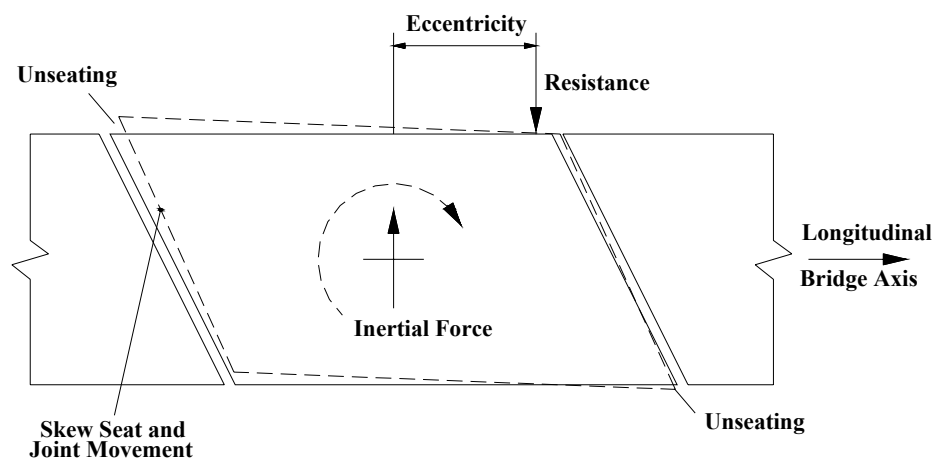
Unseating due to bridge skew - plan view of bridge deck (after Priestly *et al.*, 1996)
